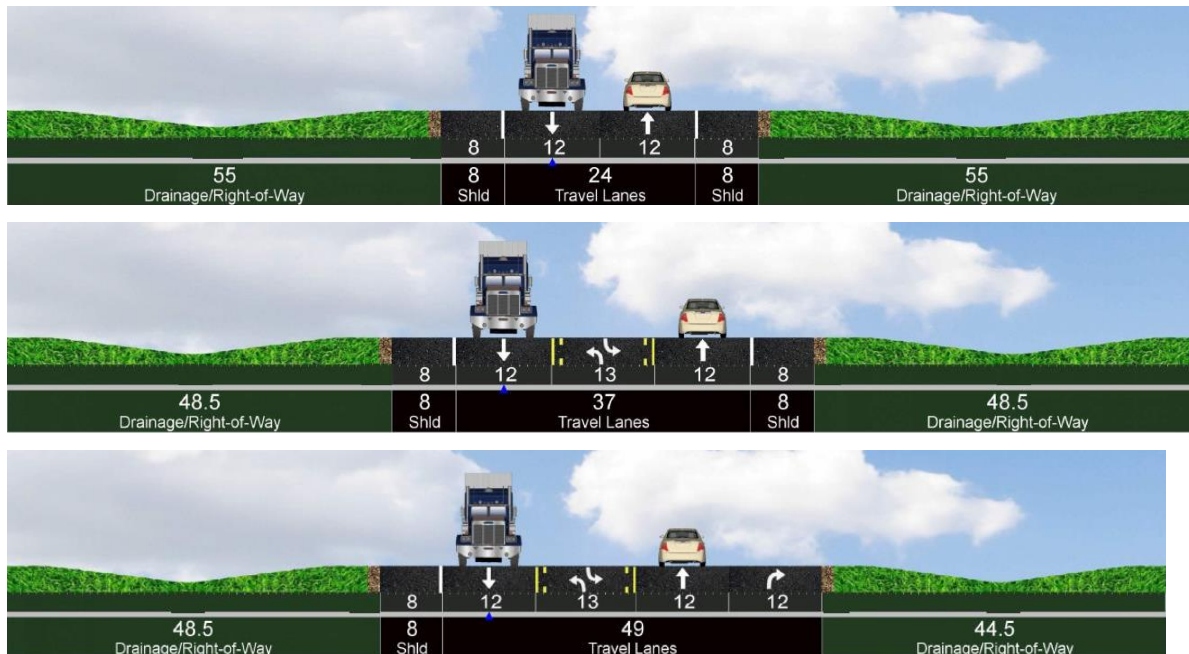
Roadway Typical Section Comparison – 23rd Street NW to 140th Street SW
